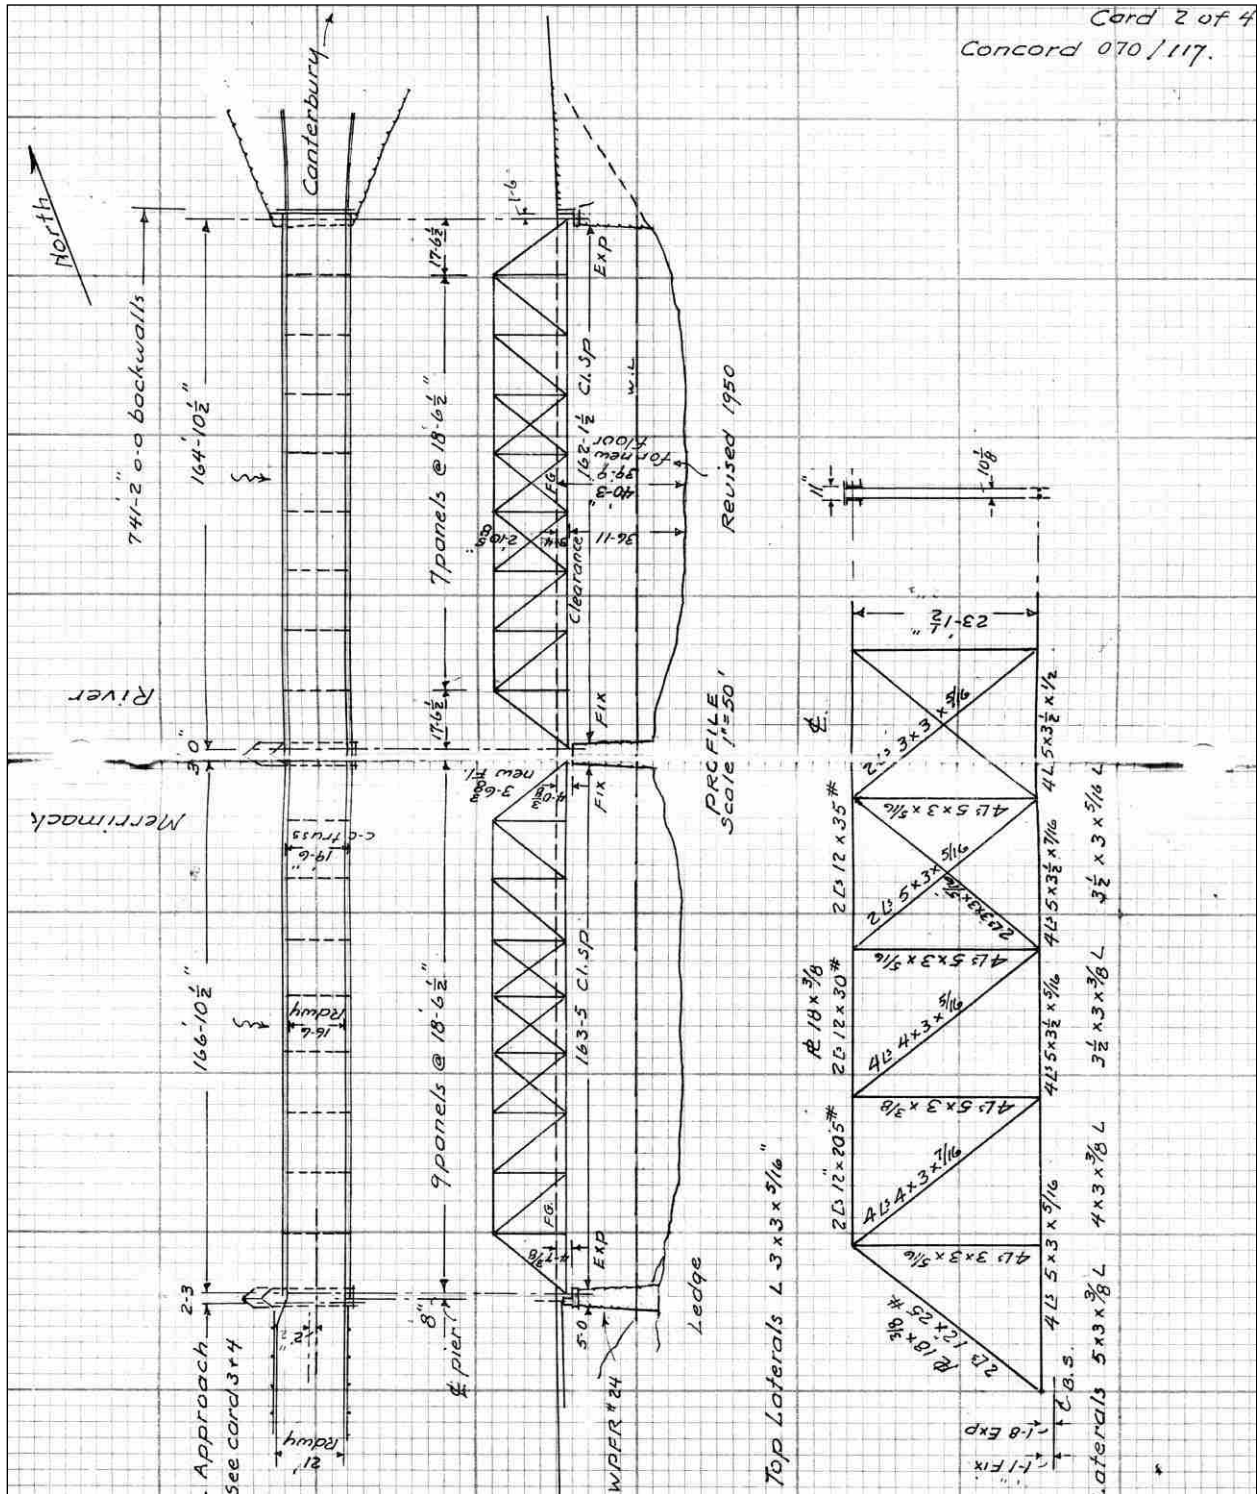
Sewall's Falls Bridge, plan, elevation and truss members. Field inspection sketches made by NHHD engineer Wendell H. Piper, May 15, 1942 (NHHD Bridge Inventory Card, Concord 070/117).
